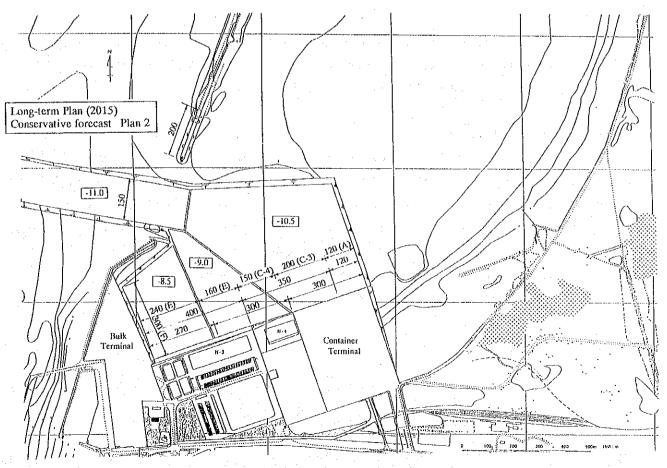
Location plan of quay structure by type, Case L-2
